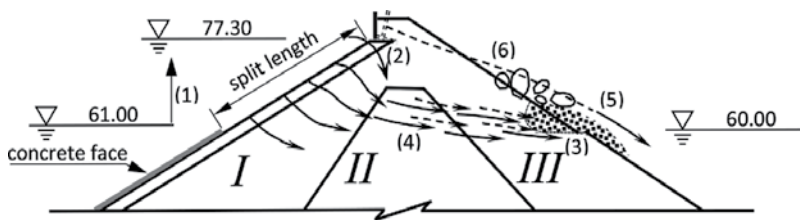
The Gouhou dam failure. Cross section and failure mechanism.
